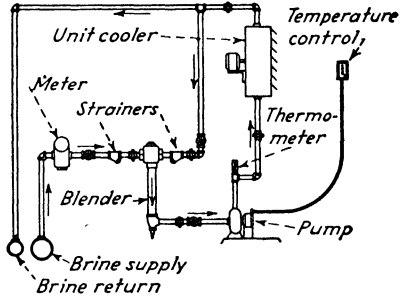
Thermostatic mixing valve controls brine flow through a unit cooler. (Courtesy of Sarco Co., Inc.)
